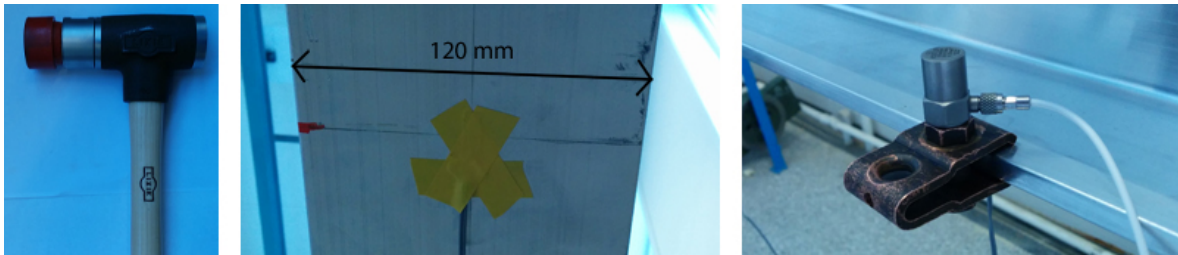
Left: Modal hammer. Middle: strain gauge glued to underside of the lower flange and secured with tape. Right: accelerometer clamped to lower flange.
